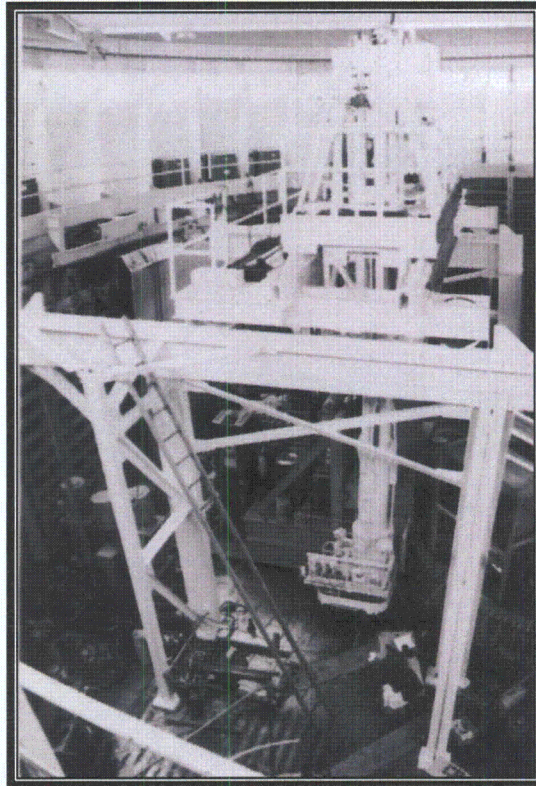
Second gripper mechanism erected in containment building (Courtesy DECo)
